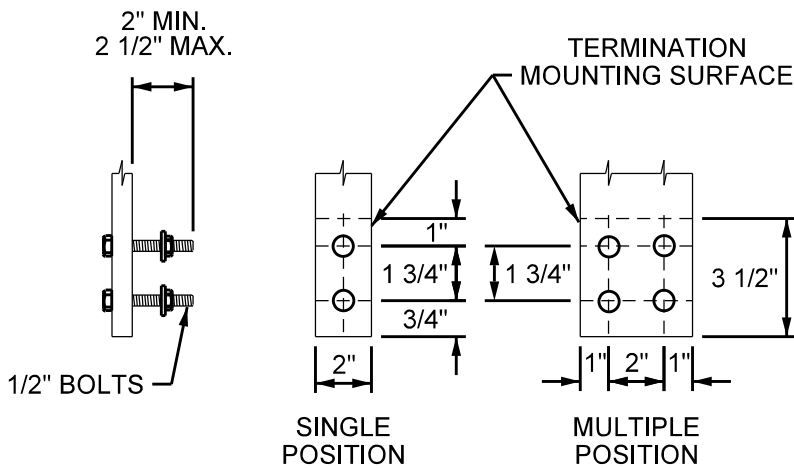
TERMINATING BOLT AND DRILLING DETAIL OF TERMINATING FACILITIES
